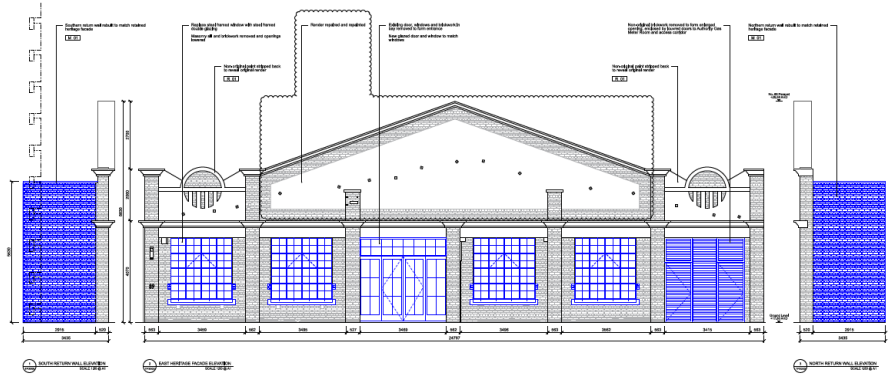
Demolition plan of the former Davis’ Pickle and Sauce Factory building’s façade as prepared by 6a Architects, dated 22 May 2020.
